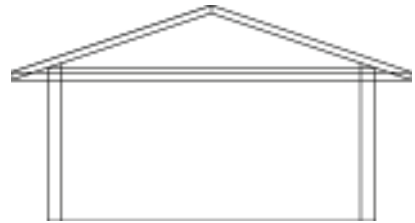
Cut 3D Object - Cut Walls to Roof Line - V
